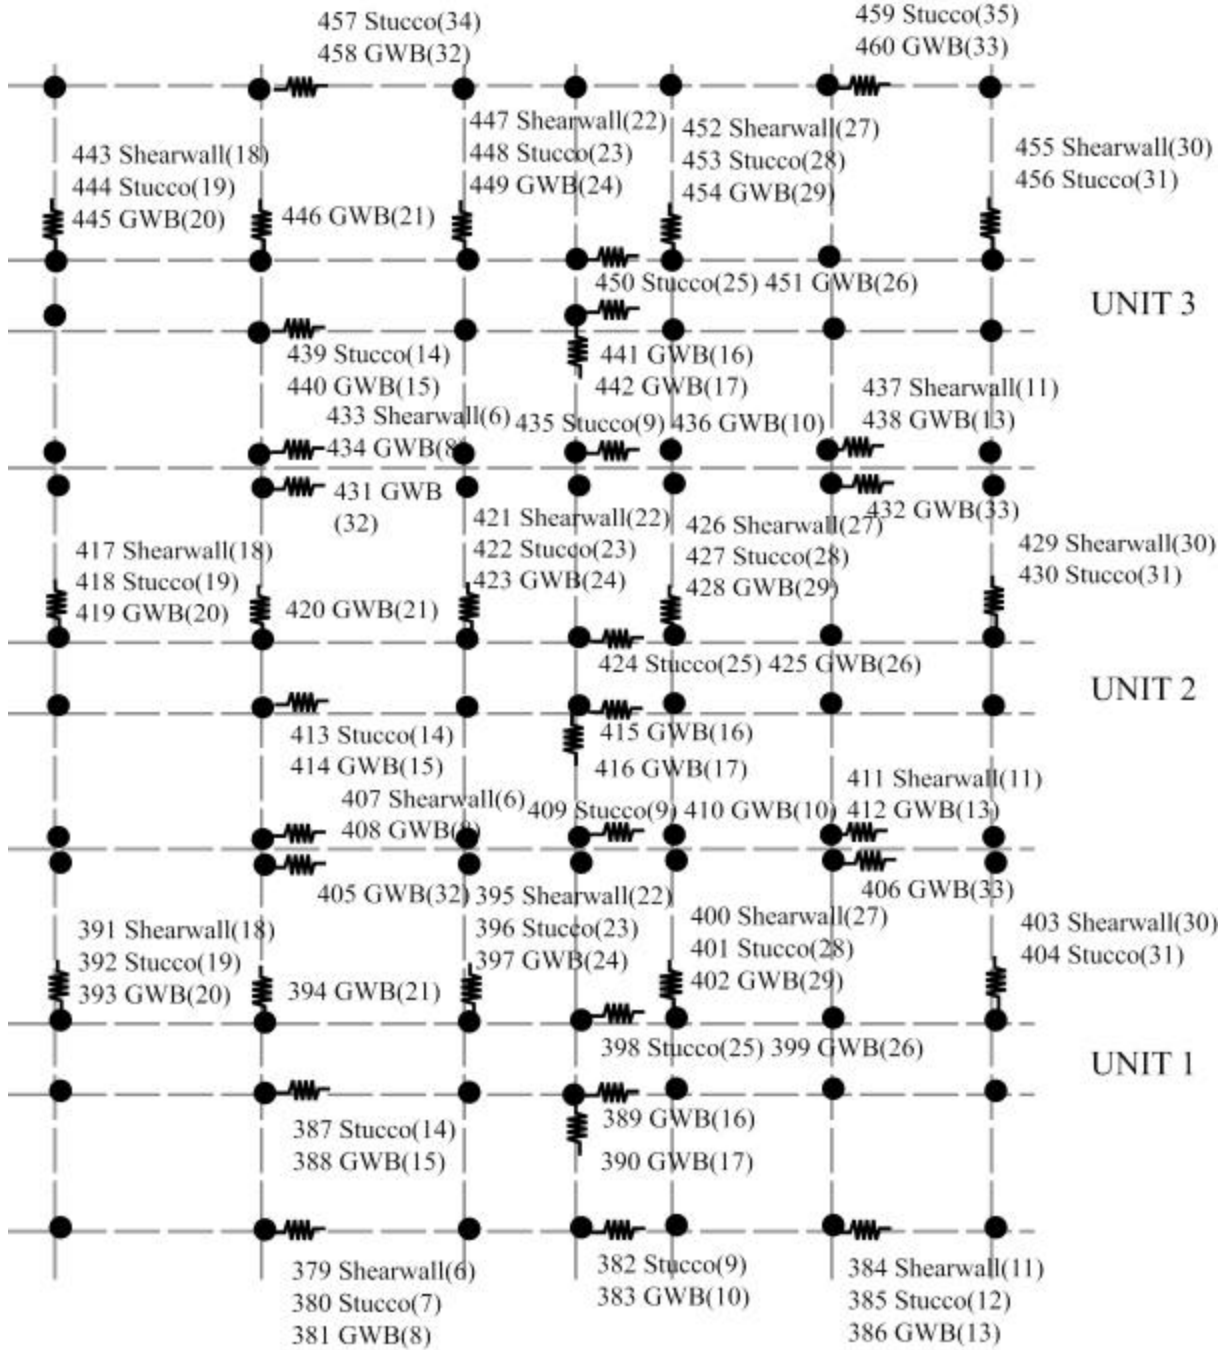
Locations, Orientation and Numbering of Shear Element for Interior and Exterior Vertical Walls on the First floor of the Townhouse Index Building.
